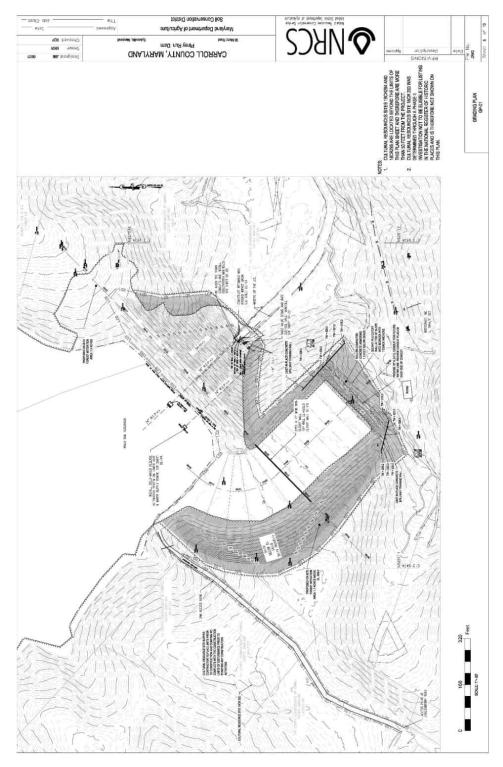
Piney Run Watershed Study plan showing the planned grading and Limit of Distrubance (LOD).
